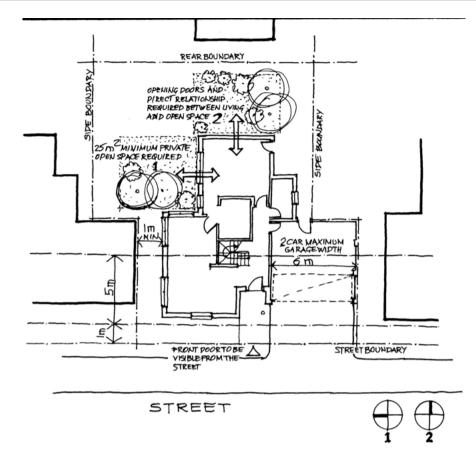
Detached family dwelling layout - zipper lot.
